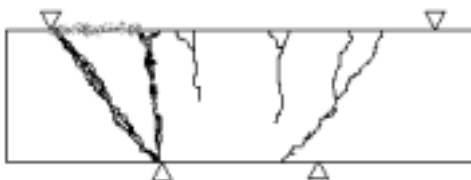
Typical failure modes and cracking for beams reinforced with the Clark Schwebel Structural Grid.
